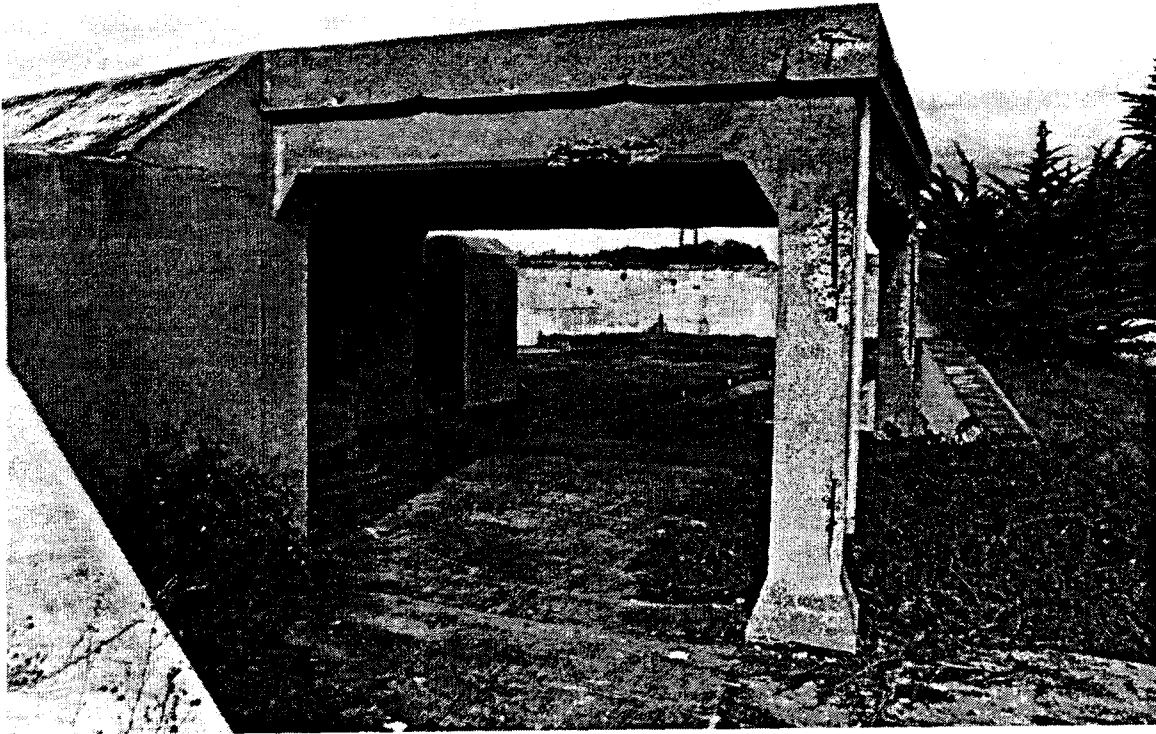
Concrete spalling is evident in the splinterproof at Battery Crosby, Fort Winfield Scott, constructed 1899-1900. Splinterproof added between 1904 and 1912.
